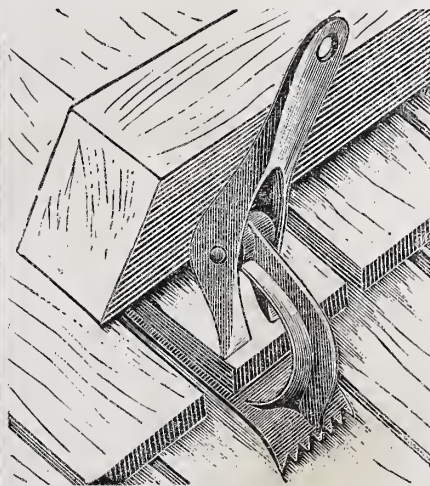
Kennett's Shingling Bracket, About Half Full Size.
